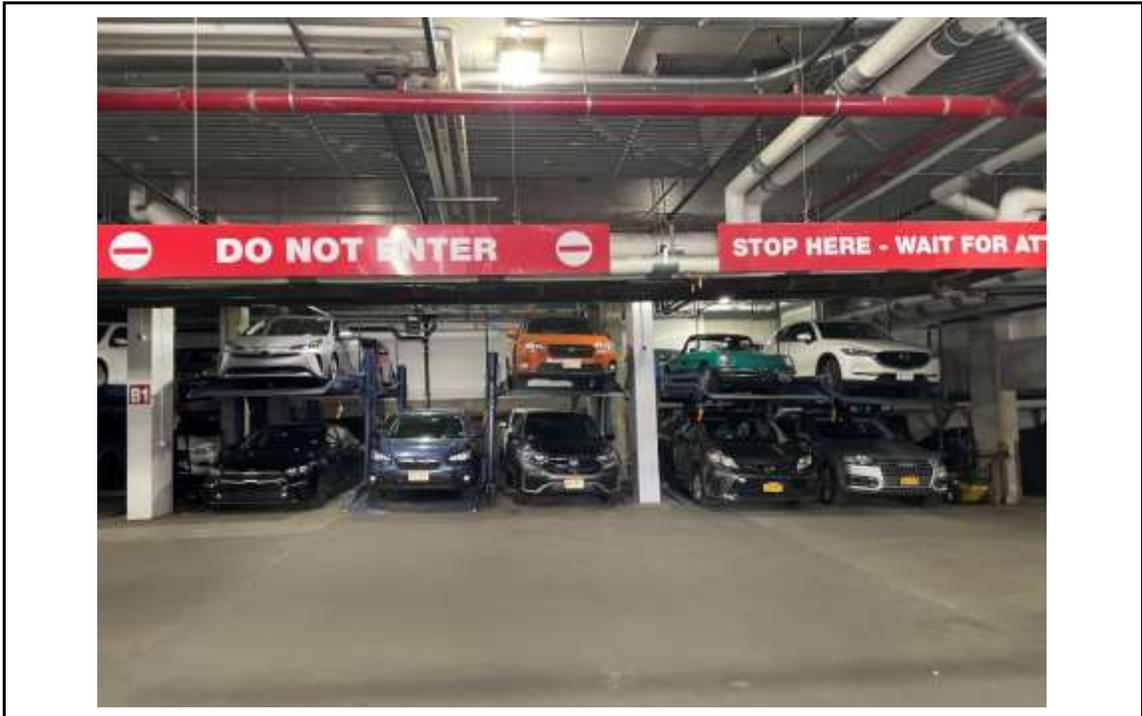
Subgrade parking garage entrance on 2nd Street, facing north. 20 June 2022.
